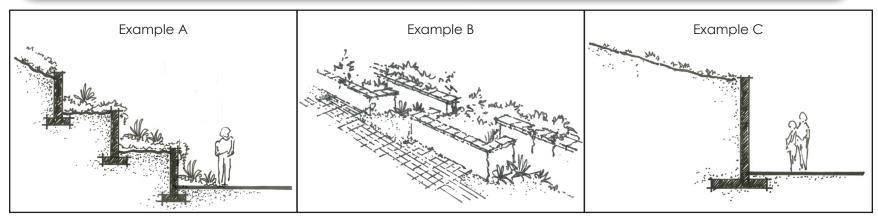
Examples A and B Use Methods to Soften the Appearance of a Large Retaining Wall as Shown in Example C.
